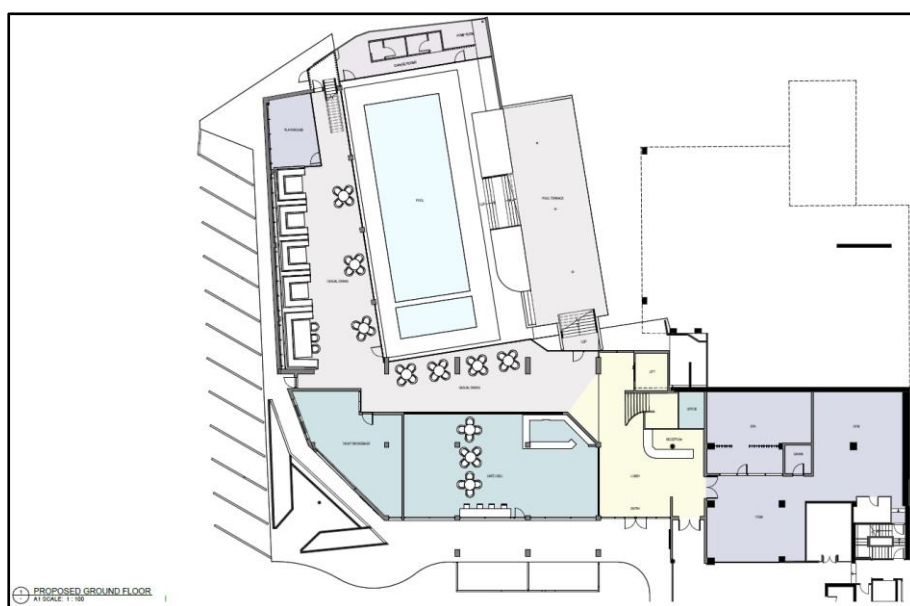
Proposed Ground Floor Plan (Source: MCHP Architects)
